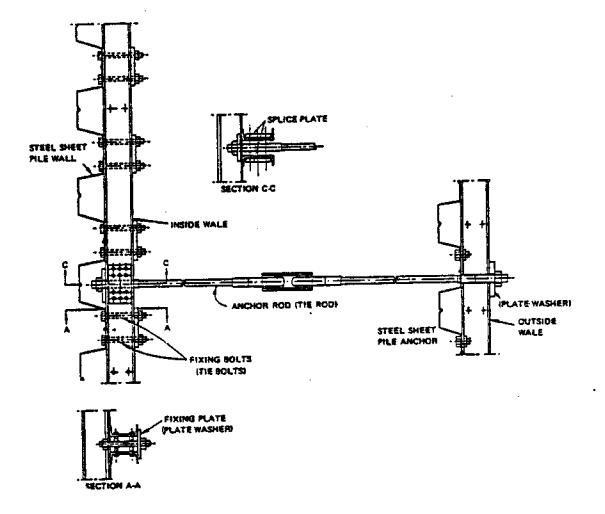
displays typical details for inside and outside wales used with steel sheet piles. Inside wales are fastened using high strength bolts in conjunction with a fixing plate. The number of bolts is determined by Equation 5-16 and the fixing plate may be dimensioned by approximating it as a simply supported beam with a point load.
